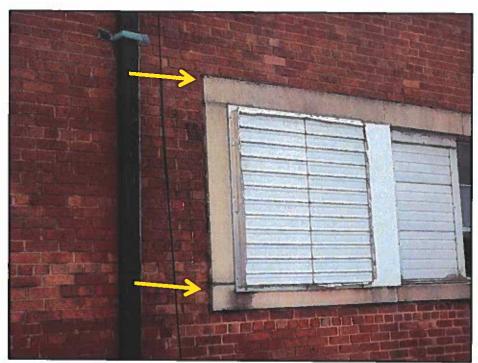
Exterior precast has shifted inward into the space. Front Right side of gym.
